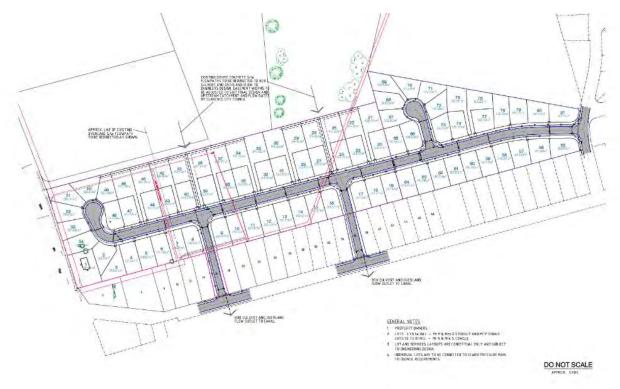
Concept subdivision plan for subject site. Note, only lots 1-54 are on the subject site (Source: North Terrace Development - Preliminary Hydraulic Impact Assessment, GHD 2021)
